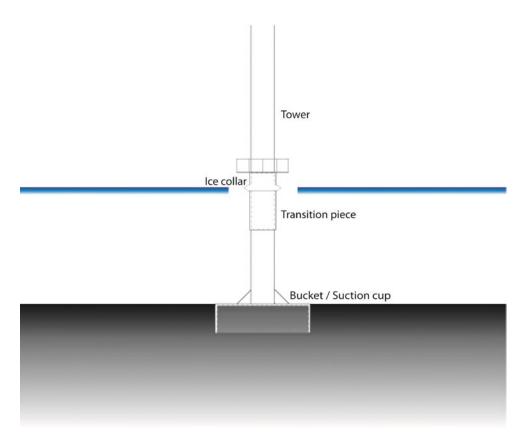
A schematic outline of a bucket foundation. The scale is not proportional; for details see section 2.5.
